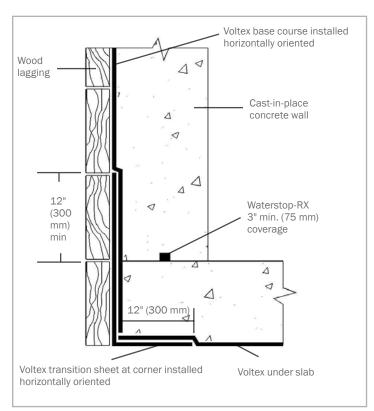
SLAB-TO-WALL TRANSITION - Voltex corner transition sheet should extend past the height of the top of the finished slab level a minimum 12" (300 mm) and extend under the slab 12" (300 mm).
